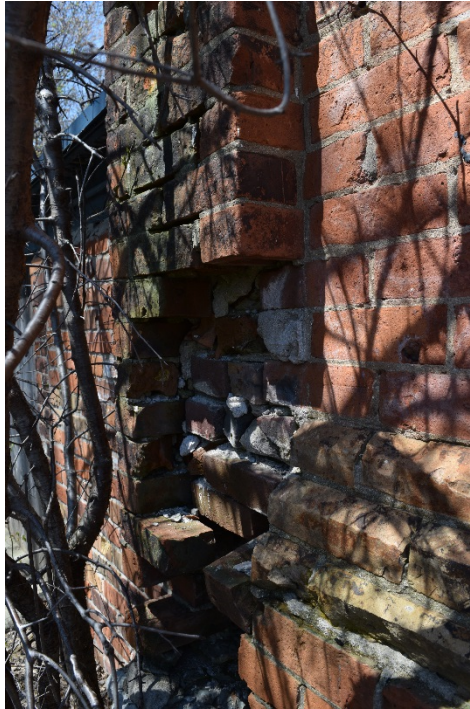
Section of collapsed outer wythe on the brick basement access addition (May 2016).
